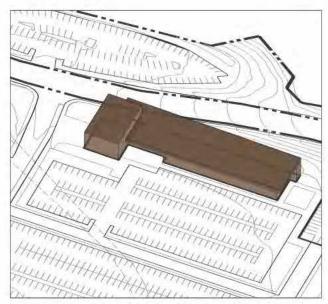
Axonometric and Site Plan of new Cosmetology building
